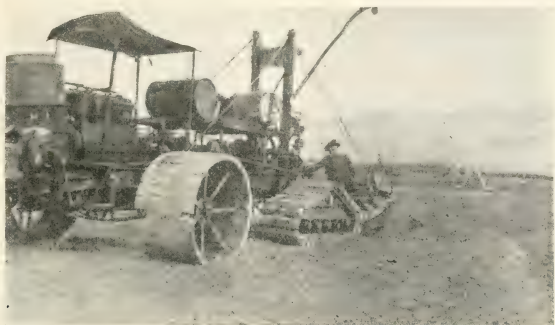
DRAINAGE MACHINE WITH THE DIGGING WHEEL IN THE TRENCH.
